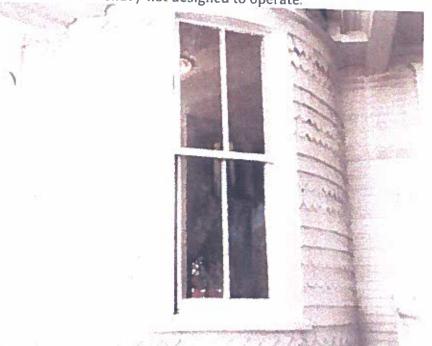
Window to the left of entrance door, facing approx.. north. Window panes appear modern. Paint shut.
